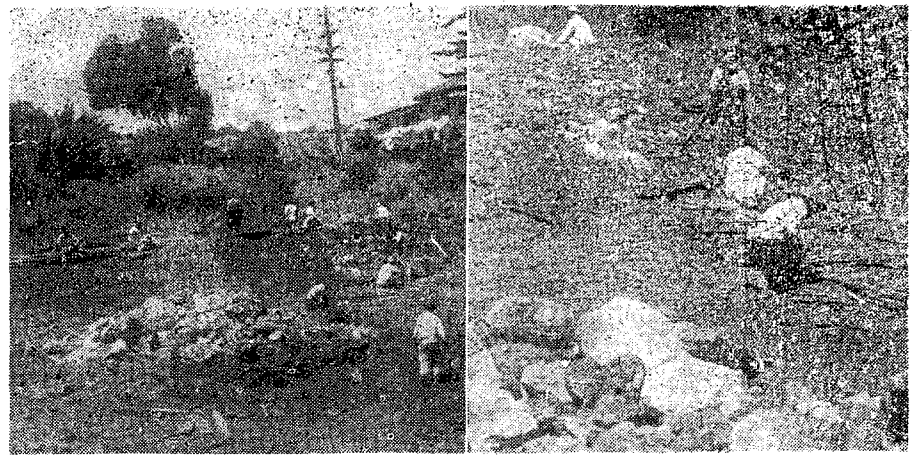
PHOTO AT RIGHT shows ground being surveyed in Honokaa at the site chosen for Unit 12's new union building. Left panel shows Honokaa unit members preparing the ground for the construction of the building.
